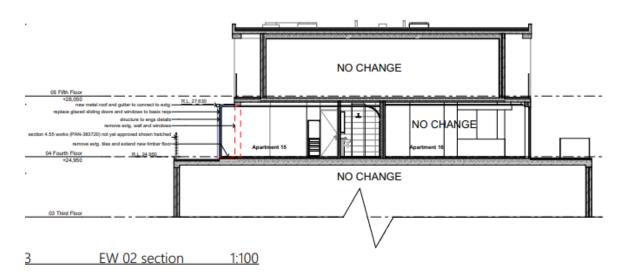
Approved (DA-373/2023) section detail with metal roof RL 27.630. (Source – RAA Architects)
